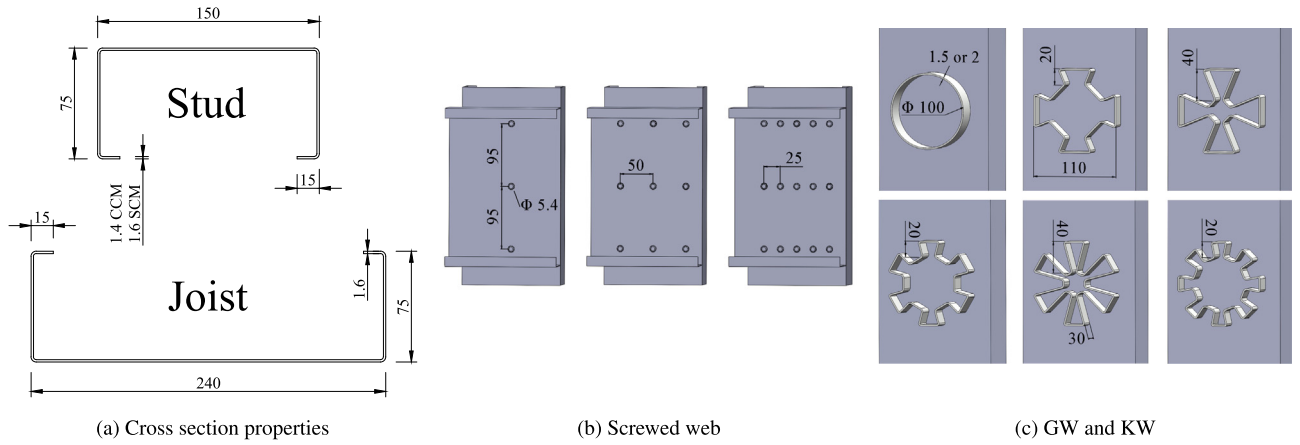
Cross-sections of the CFS members and connection configurations (all dimensions in mm).
